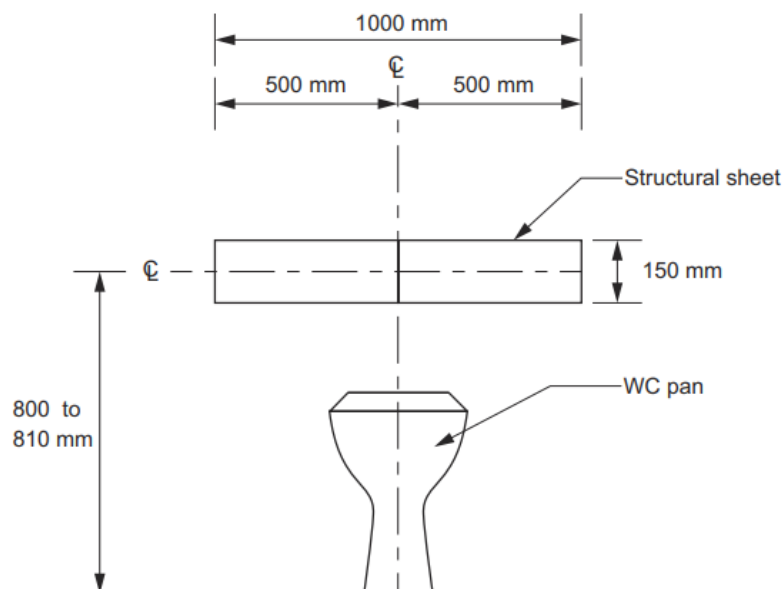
Location of noggings for a wall behind a toilet pan
